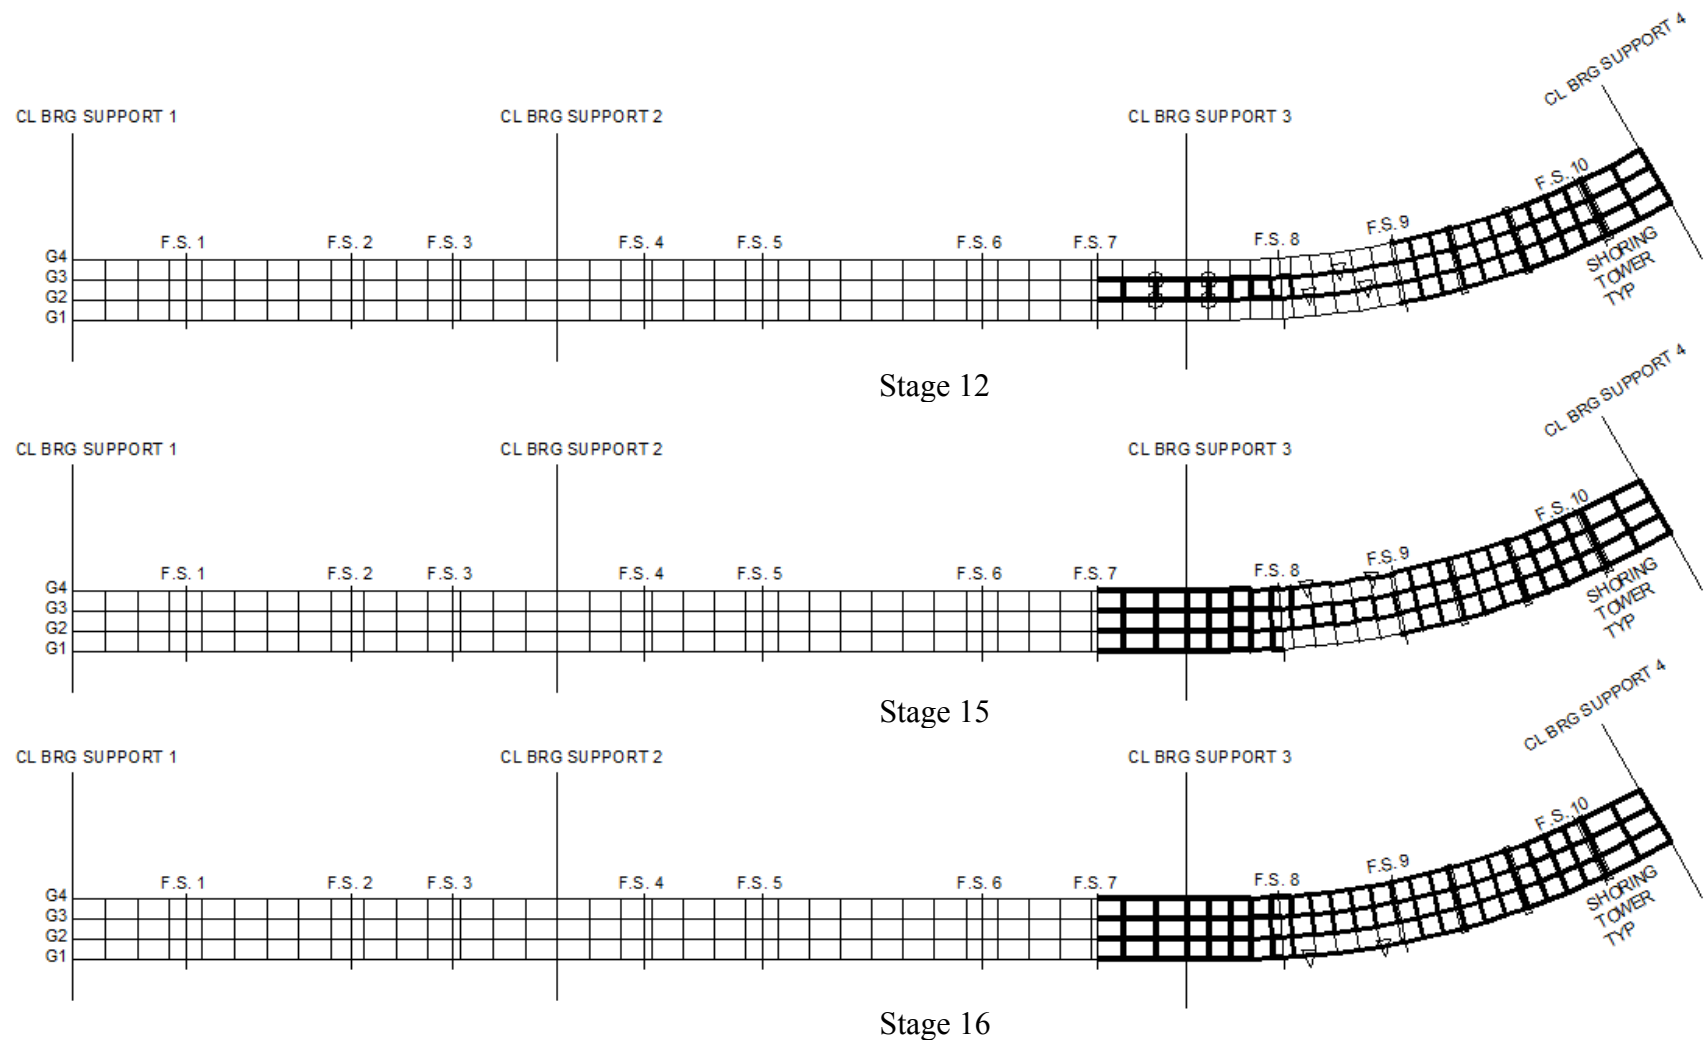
Erection stages involving field splice connections of drop-in segments in Bridge (E) EICCR11.
